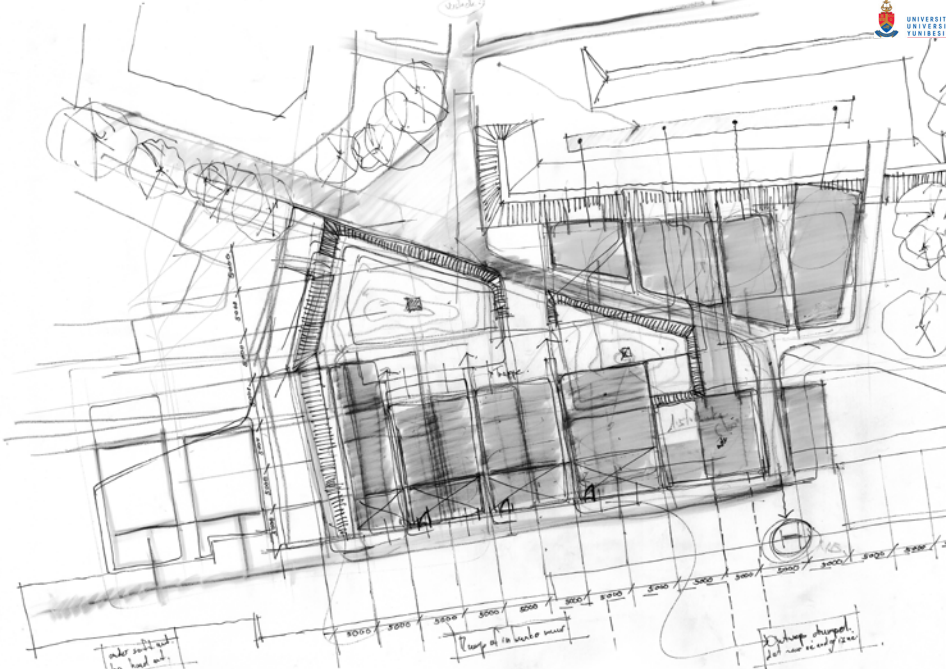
Concept drawings showing the development of the building plan (Author, 2011)
